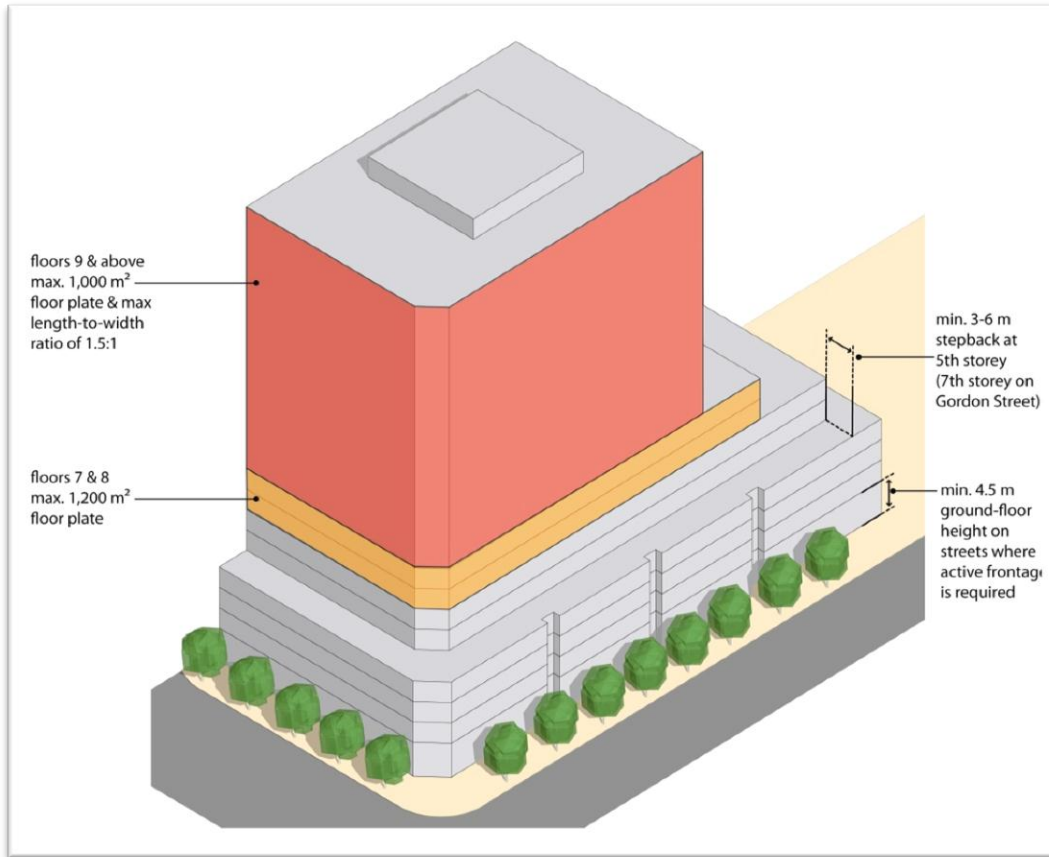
Floorplate Illustration (Downtown Built Form Standards)
